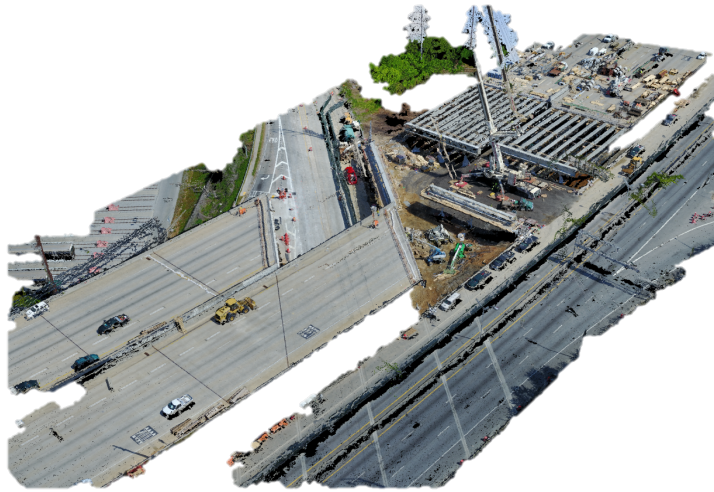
PCD model (Bridge Construction above, Road Construction below)
